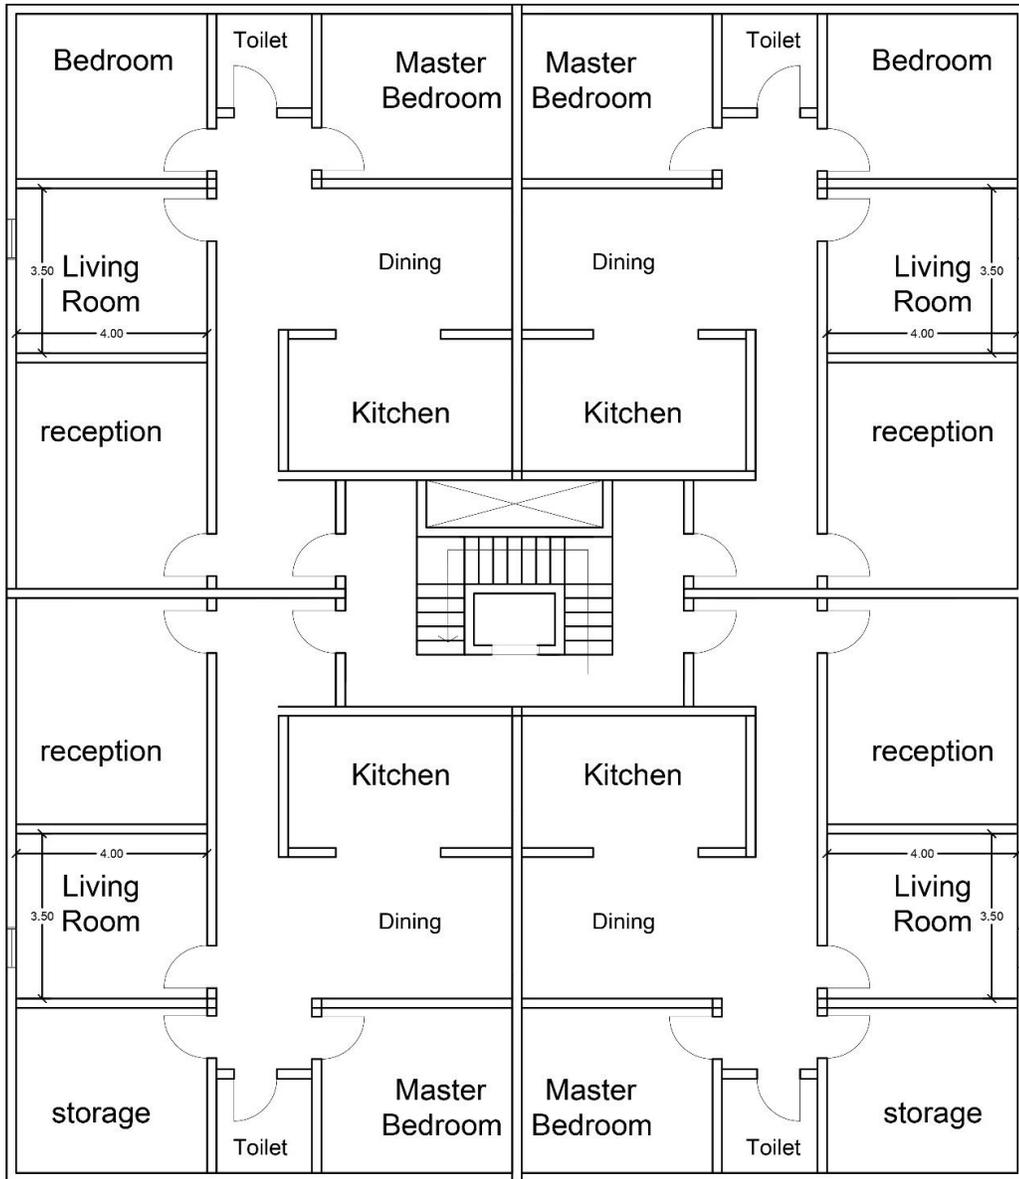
Floor plan for Contemporary block of flats (category 2)
